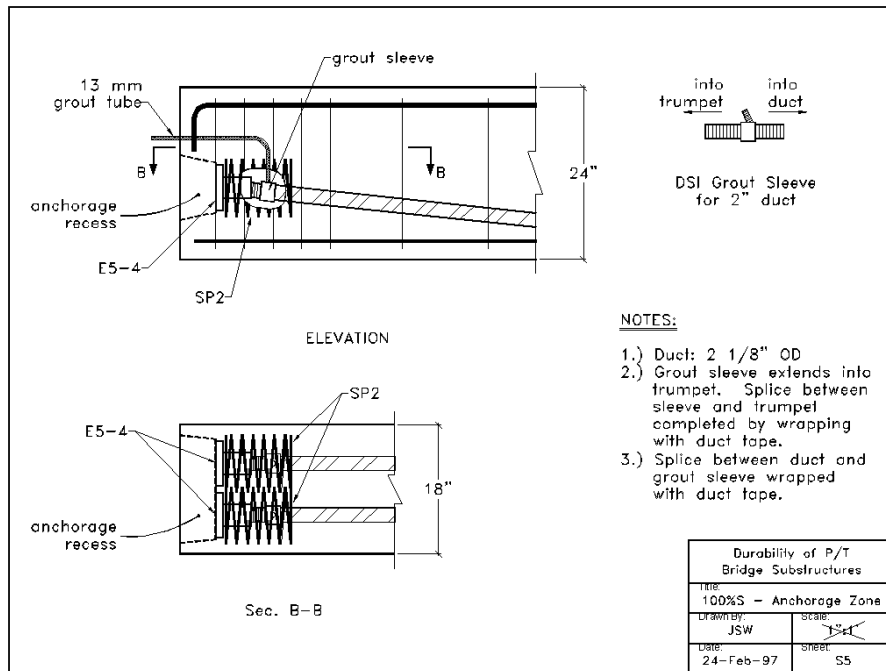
Sheet S5: 100%S Anchorage Zone 4.2
